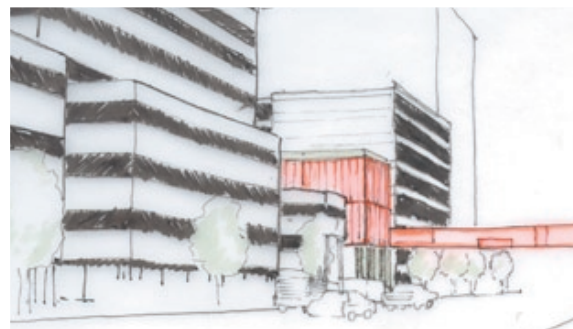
View from cnr. of Prinsloo Street and Pretorius Street
